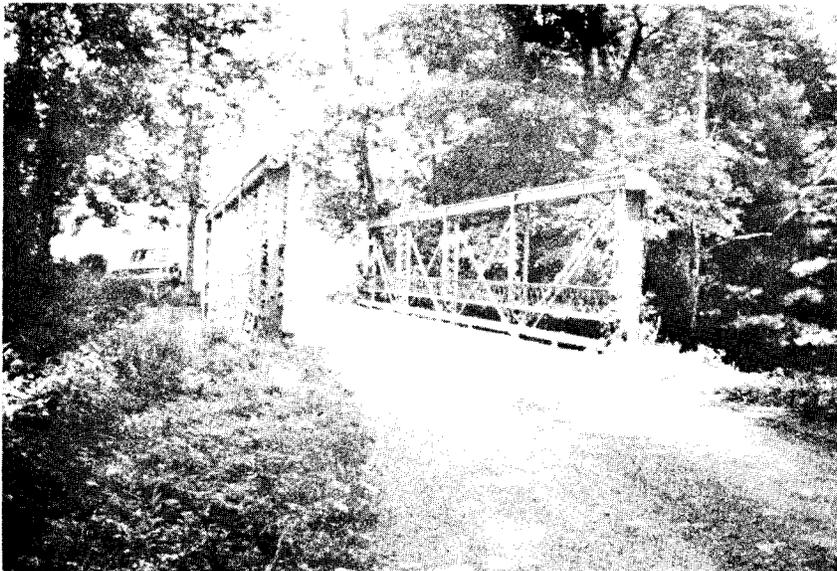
One of five bedstead/truss leg bridges built in the Staunton Construction District; dates unknown. (See form/photo number 08-07-13.)
